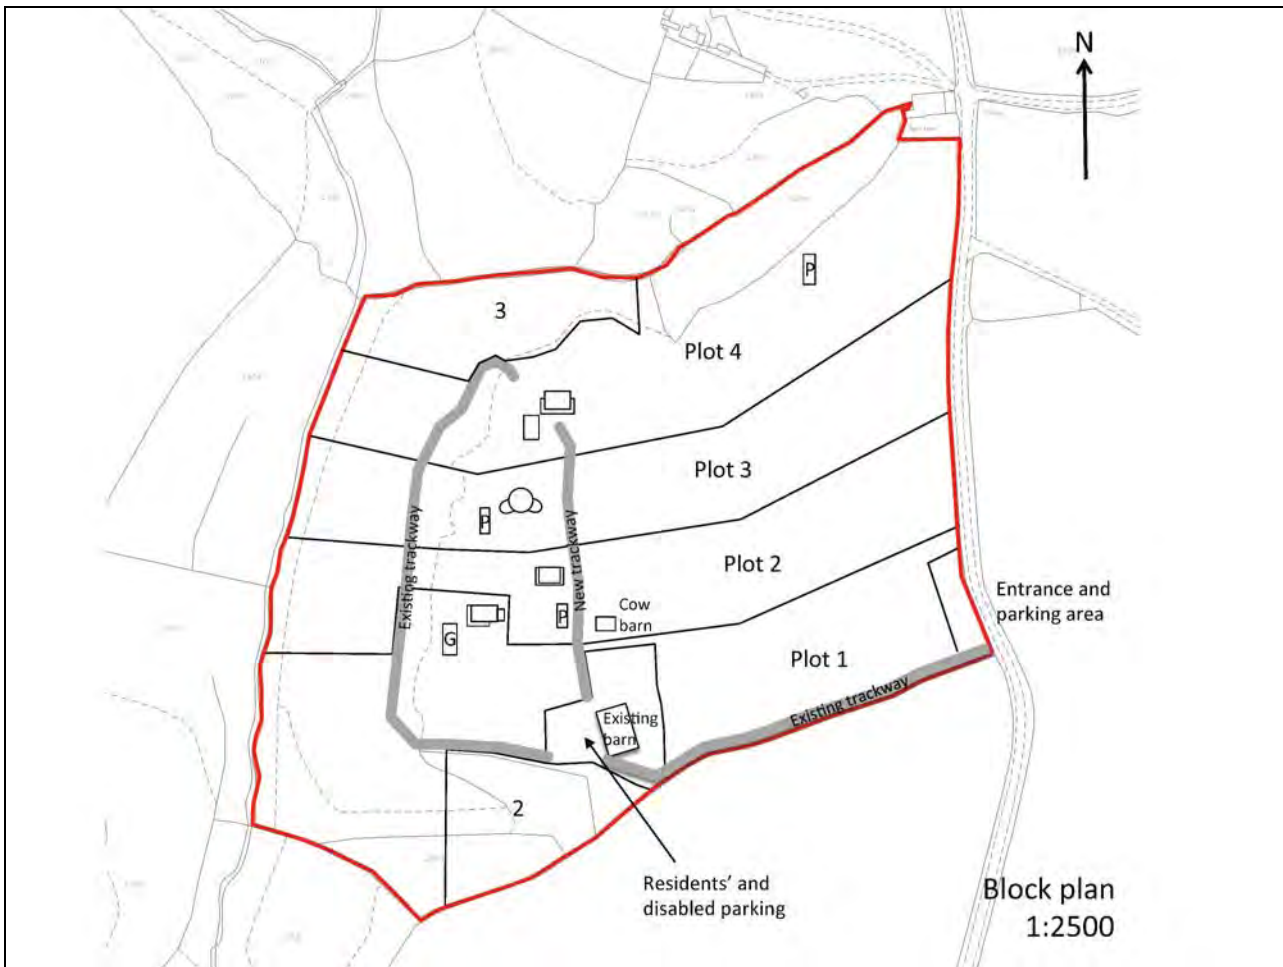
Layout of the proposed development, supplied by client as part of planning application. The dwellings lie on a natural terrace running roughly north to south. To the west the land slopes down steeply to the Nant Colomendy. Previously small plots have been created on this slope, see Figure 3 for detail, but these are now disused and overgrown with scrub. To the east the land rises relatively steeply to the road. There are no historic boundaries within the plot, these having been removed at some point prior to 1972. Figure 4, the parish tithe map, shows the former divisions.
